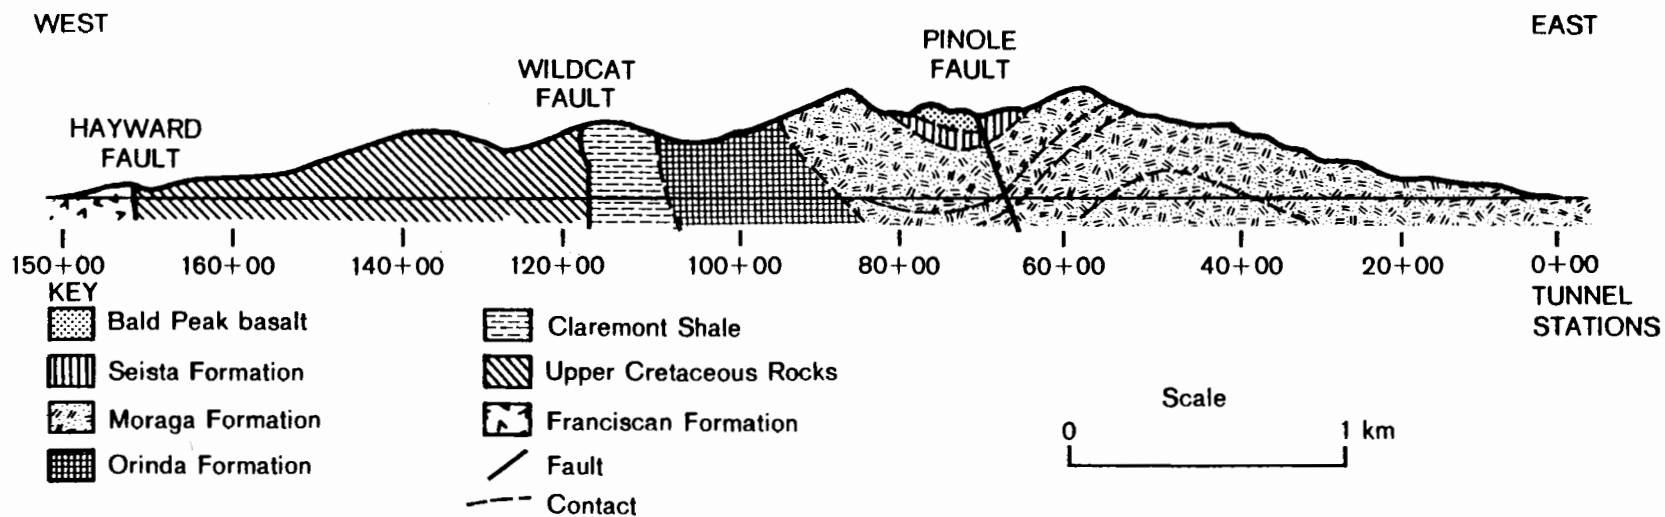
Section along Claremont Tunnel through Berkeley Hills (after East Bay Municipal Utility District Drawing DH 2120-35).
